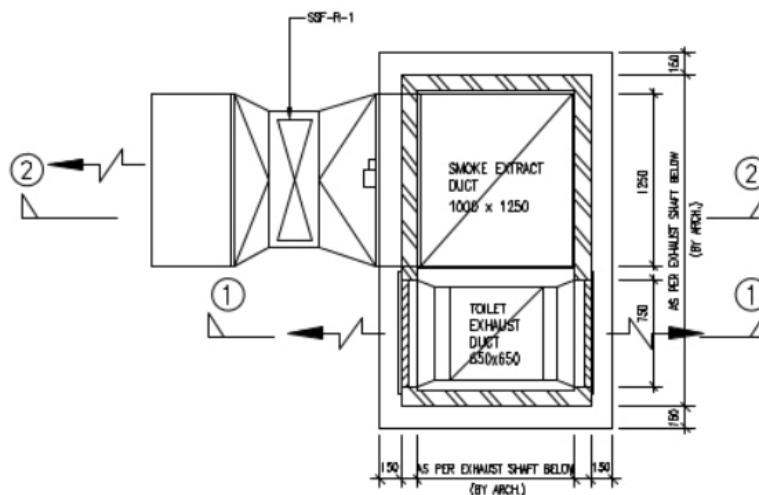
Detailed drawing of exhaust ventilation system in KLPAC
